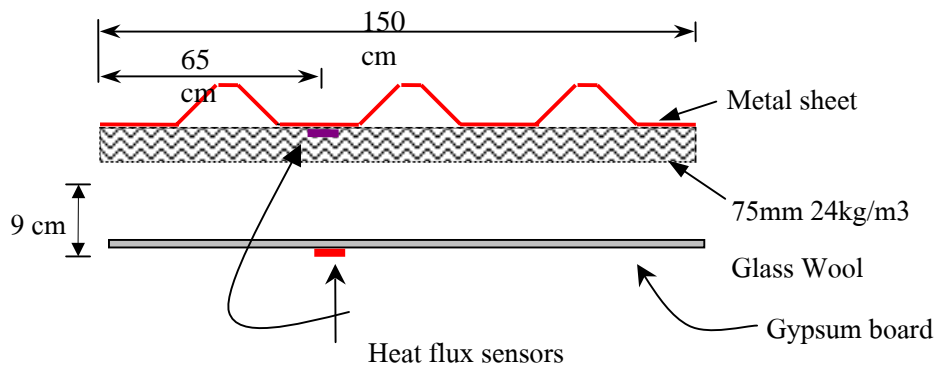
(b) Measuring positions of heat flux sensors (Glass Wool test)
